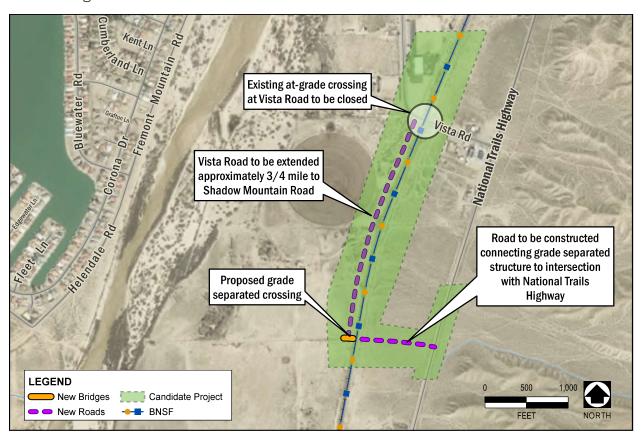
Proposed Vista Road Crossing Closure and Grade Separation Project Source: San Bernardino County, AECOM
